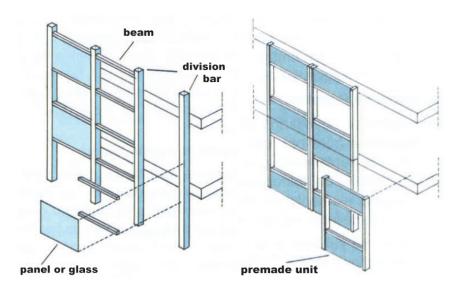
Stick Curtain Wall System on the left, Half Panel System on the right (Candemir, 2002).
